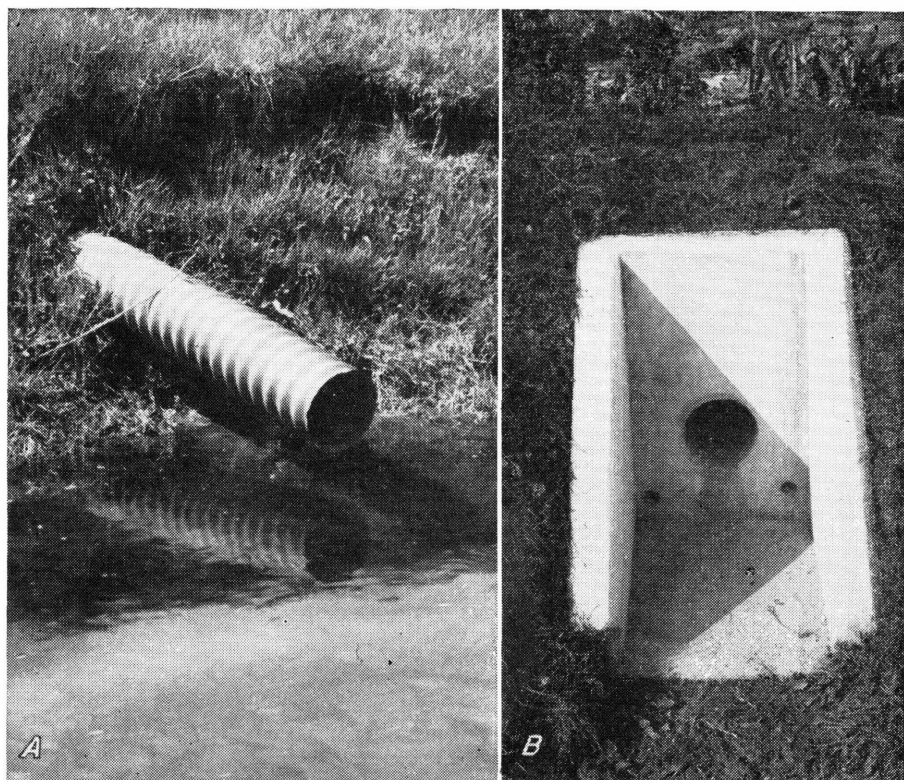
Outlet protection for tile drains: *A*, Corrugated metal pipe that will empty into the drainage ditch without eroding the ditchbank; *B*, reinforced concrete headwall, with wing walls and apron.
